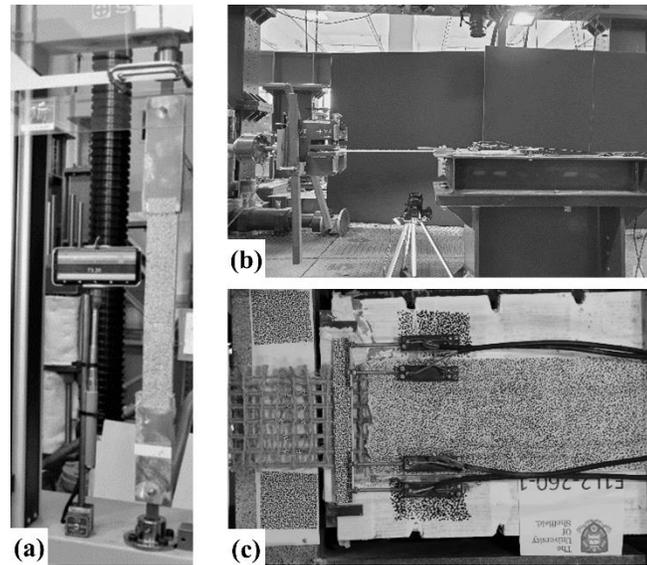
Experimental test setups: (a) tensile tests on FTRM coupons; (b) shear bond tests (side view); (c) shear bond tests (plan view) and arrangement of the potentiometers.
